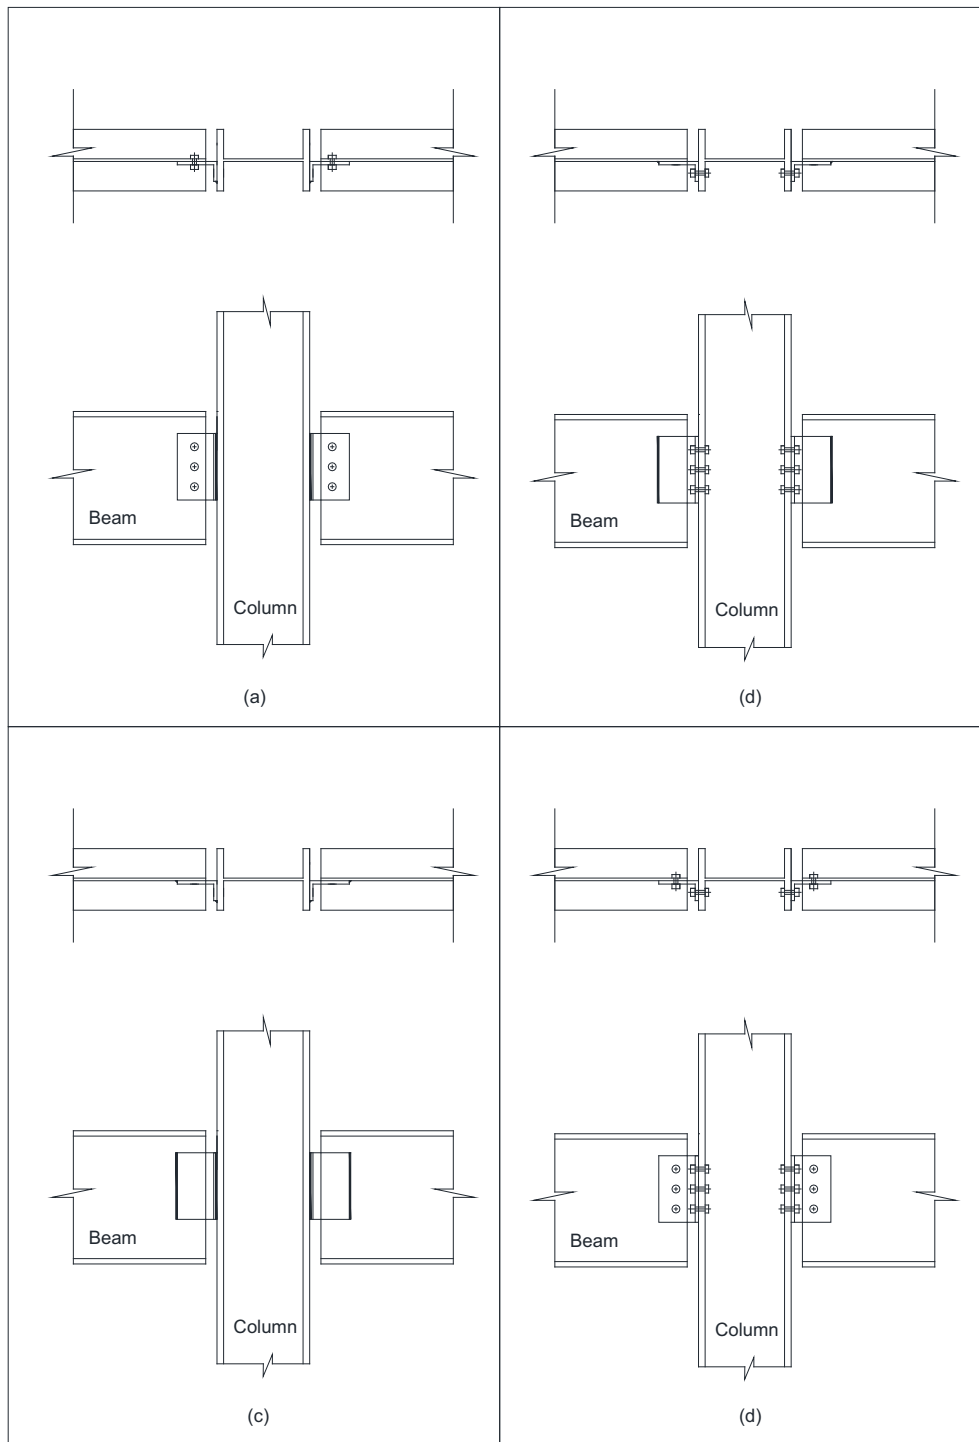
Types of single angle shear connections: (a) welded-bolted (b) bolted-welded (c) welded-welded (d) bolted-bolted.
